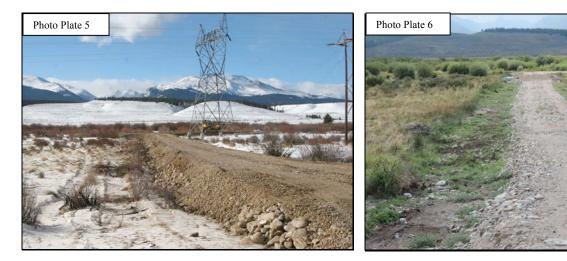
Mt Massive Bypass during construction Note: High profile and cobble foundation
